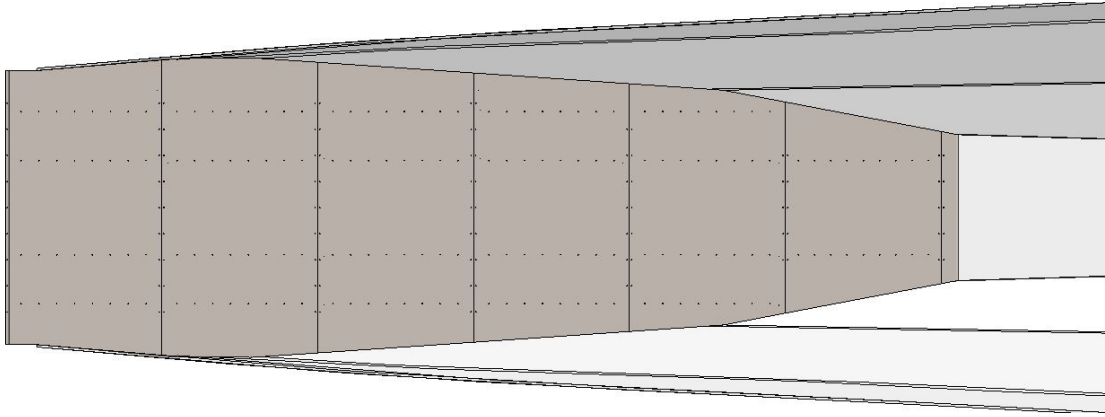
Diffuser wall geometry as seen inside concrete diffuser
